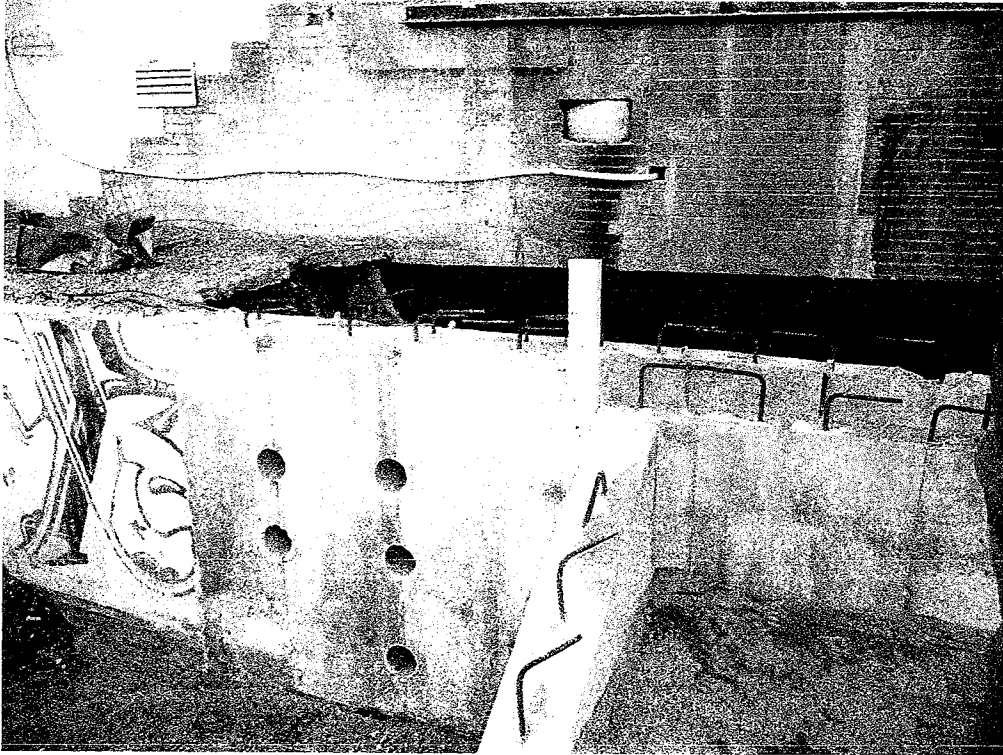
Existing (5) 6” diameter sleeves (New sleeves will align with existing – see attached Elevation A-A)
